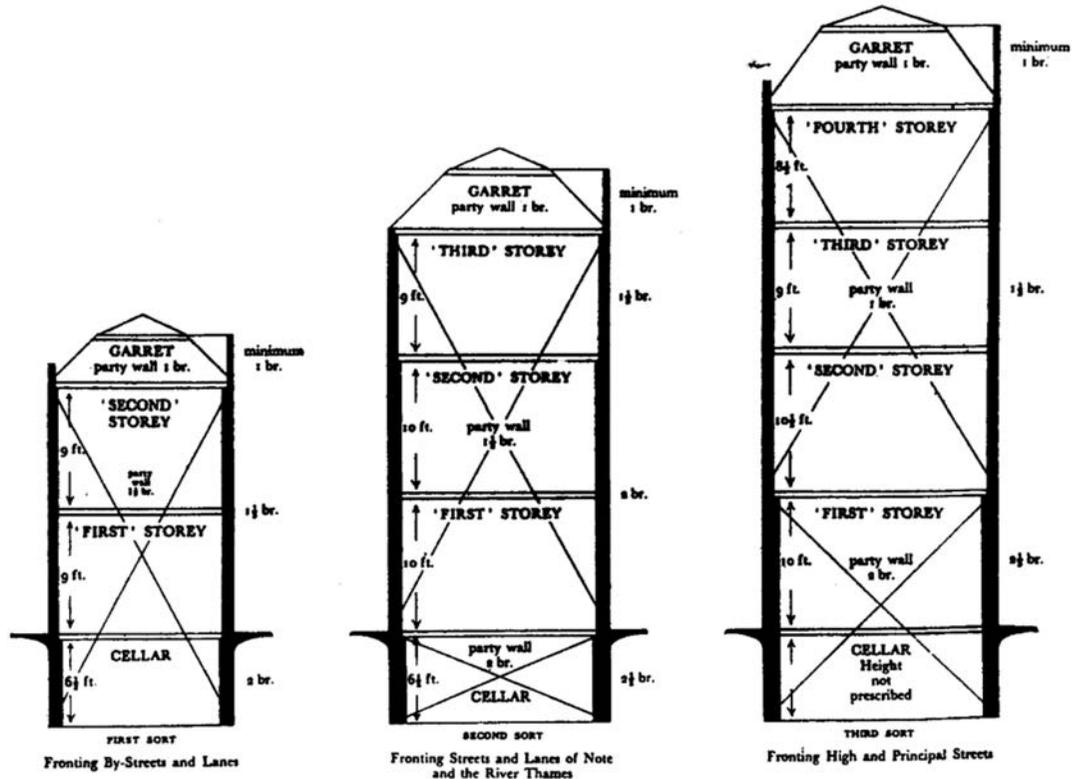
Codes from the Rebuilding Act of 1667 following the great fire of London the previous year, building types giving rise to a street typology
